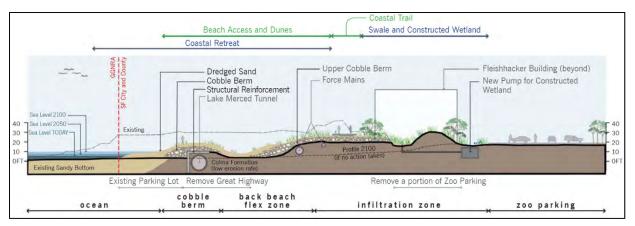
Summary of 2012 Master Plan Recommendations near Sloat Blvd/Great Highway Intersection
